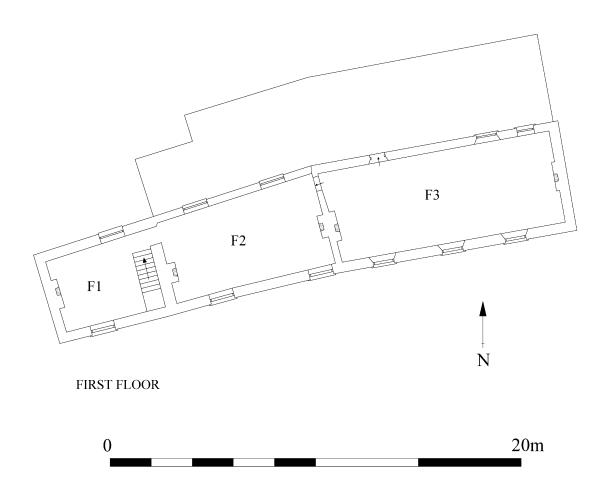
First floor plan Modified from plan supplied by ABDS Ltd
